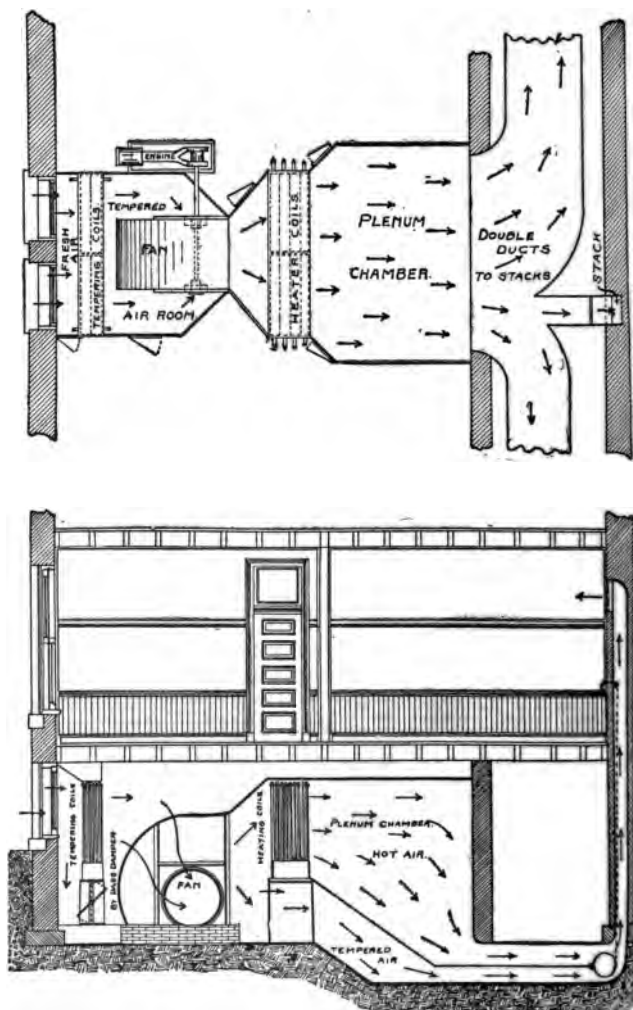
Fan Room Layout with Double Underground Ducts and Mixing Dampers at Base of Room Stacks.
